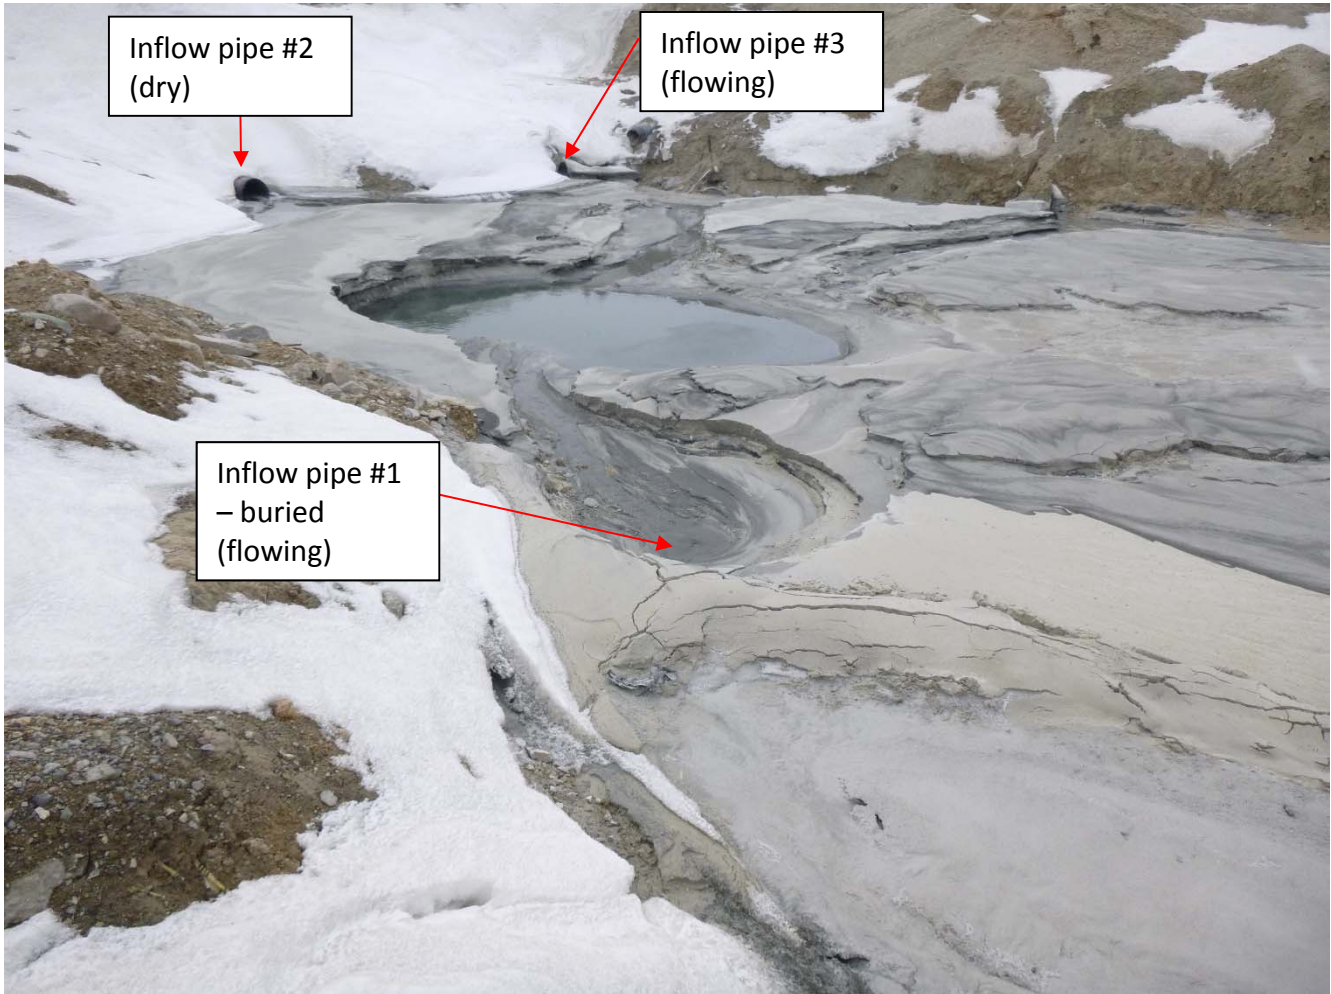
Minor inflow from pipe along east embankment. Photo taken looking north (SDP-2017-03)
